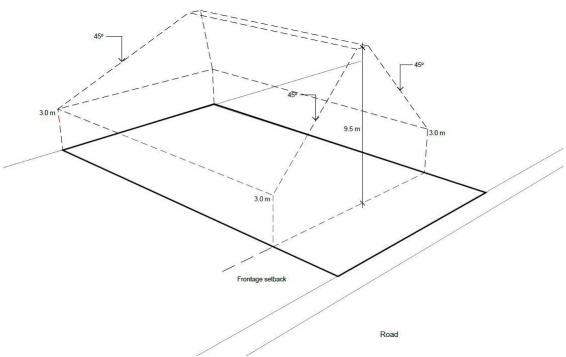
Building envelope as required by clause 11.4.2 A3(a)
